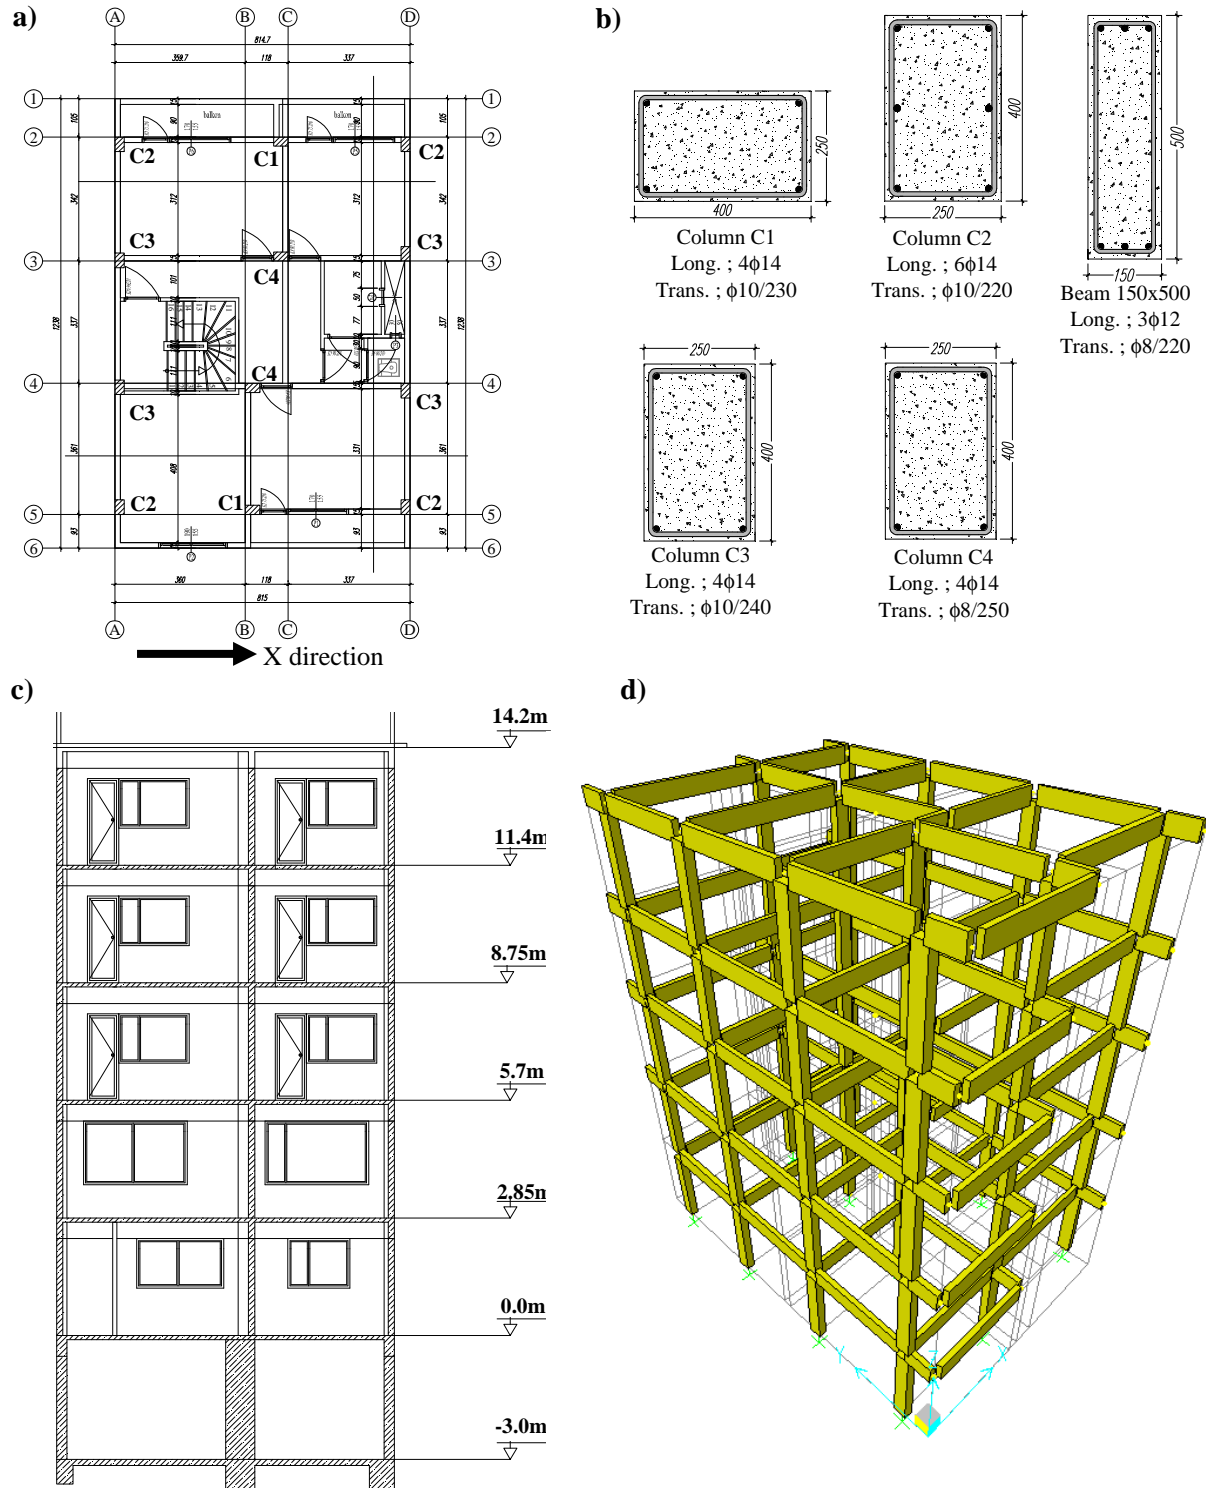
Five story building a) Plan view, b) column and beam dimensions, c) front view of the building, e) analytical model of the building (SAP2000).
